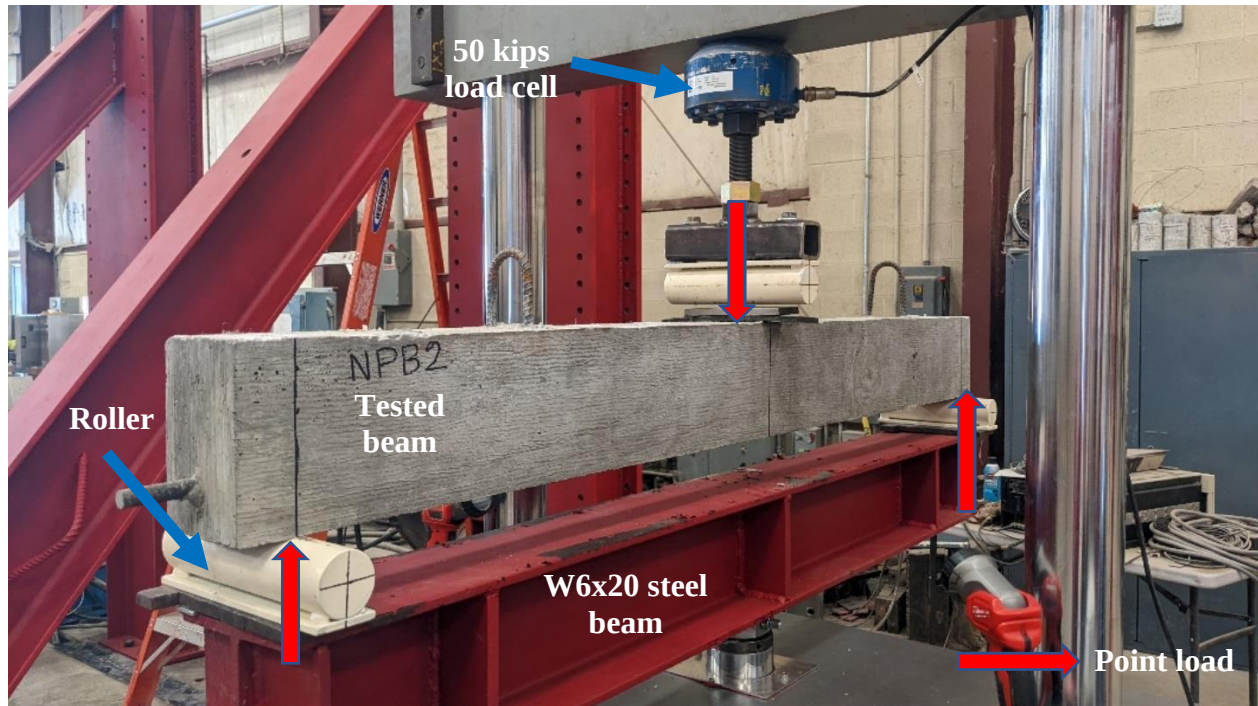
Testing setup with the nonprestressed BFRP concrete beam No. 2 ready to be tested in the MTS
